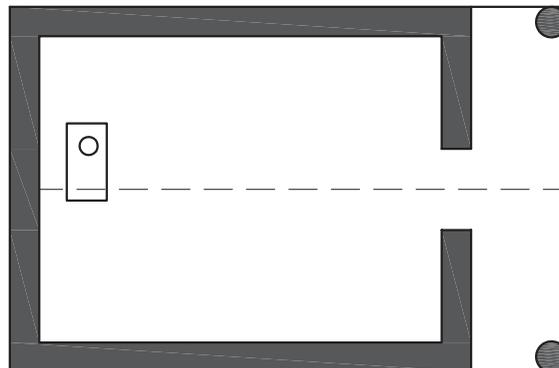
A typical plan for a Rocky Mountain-style log cabin. The door opens onto a covered porch on the gable end.
